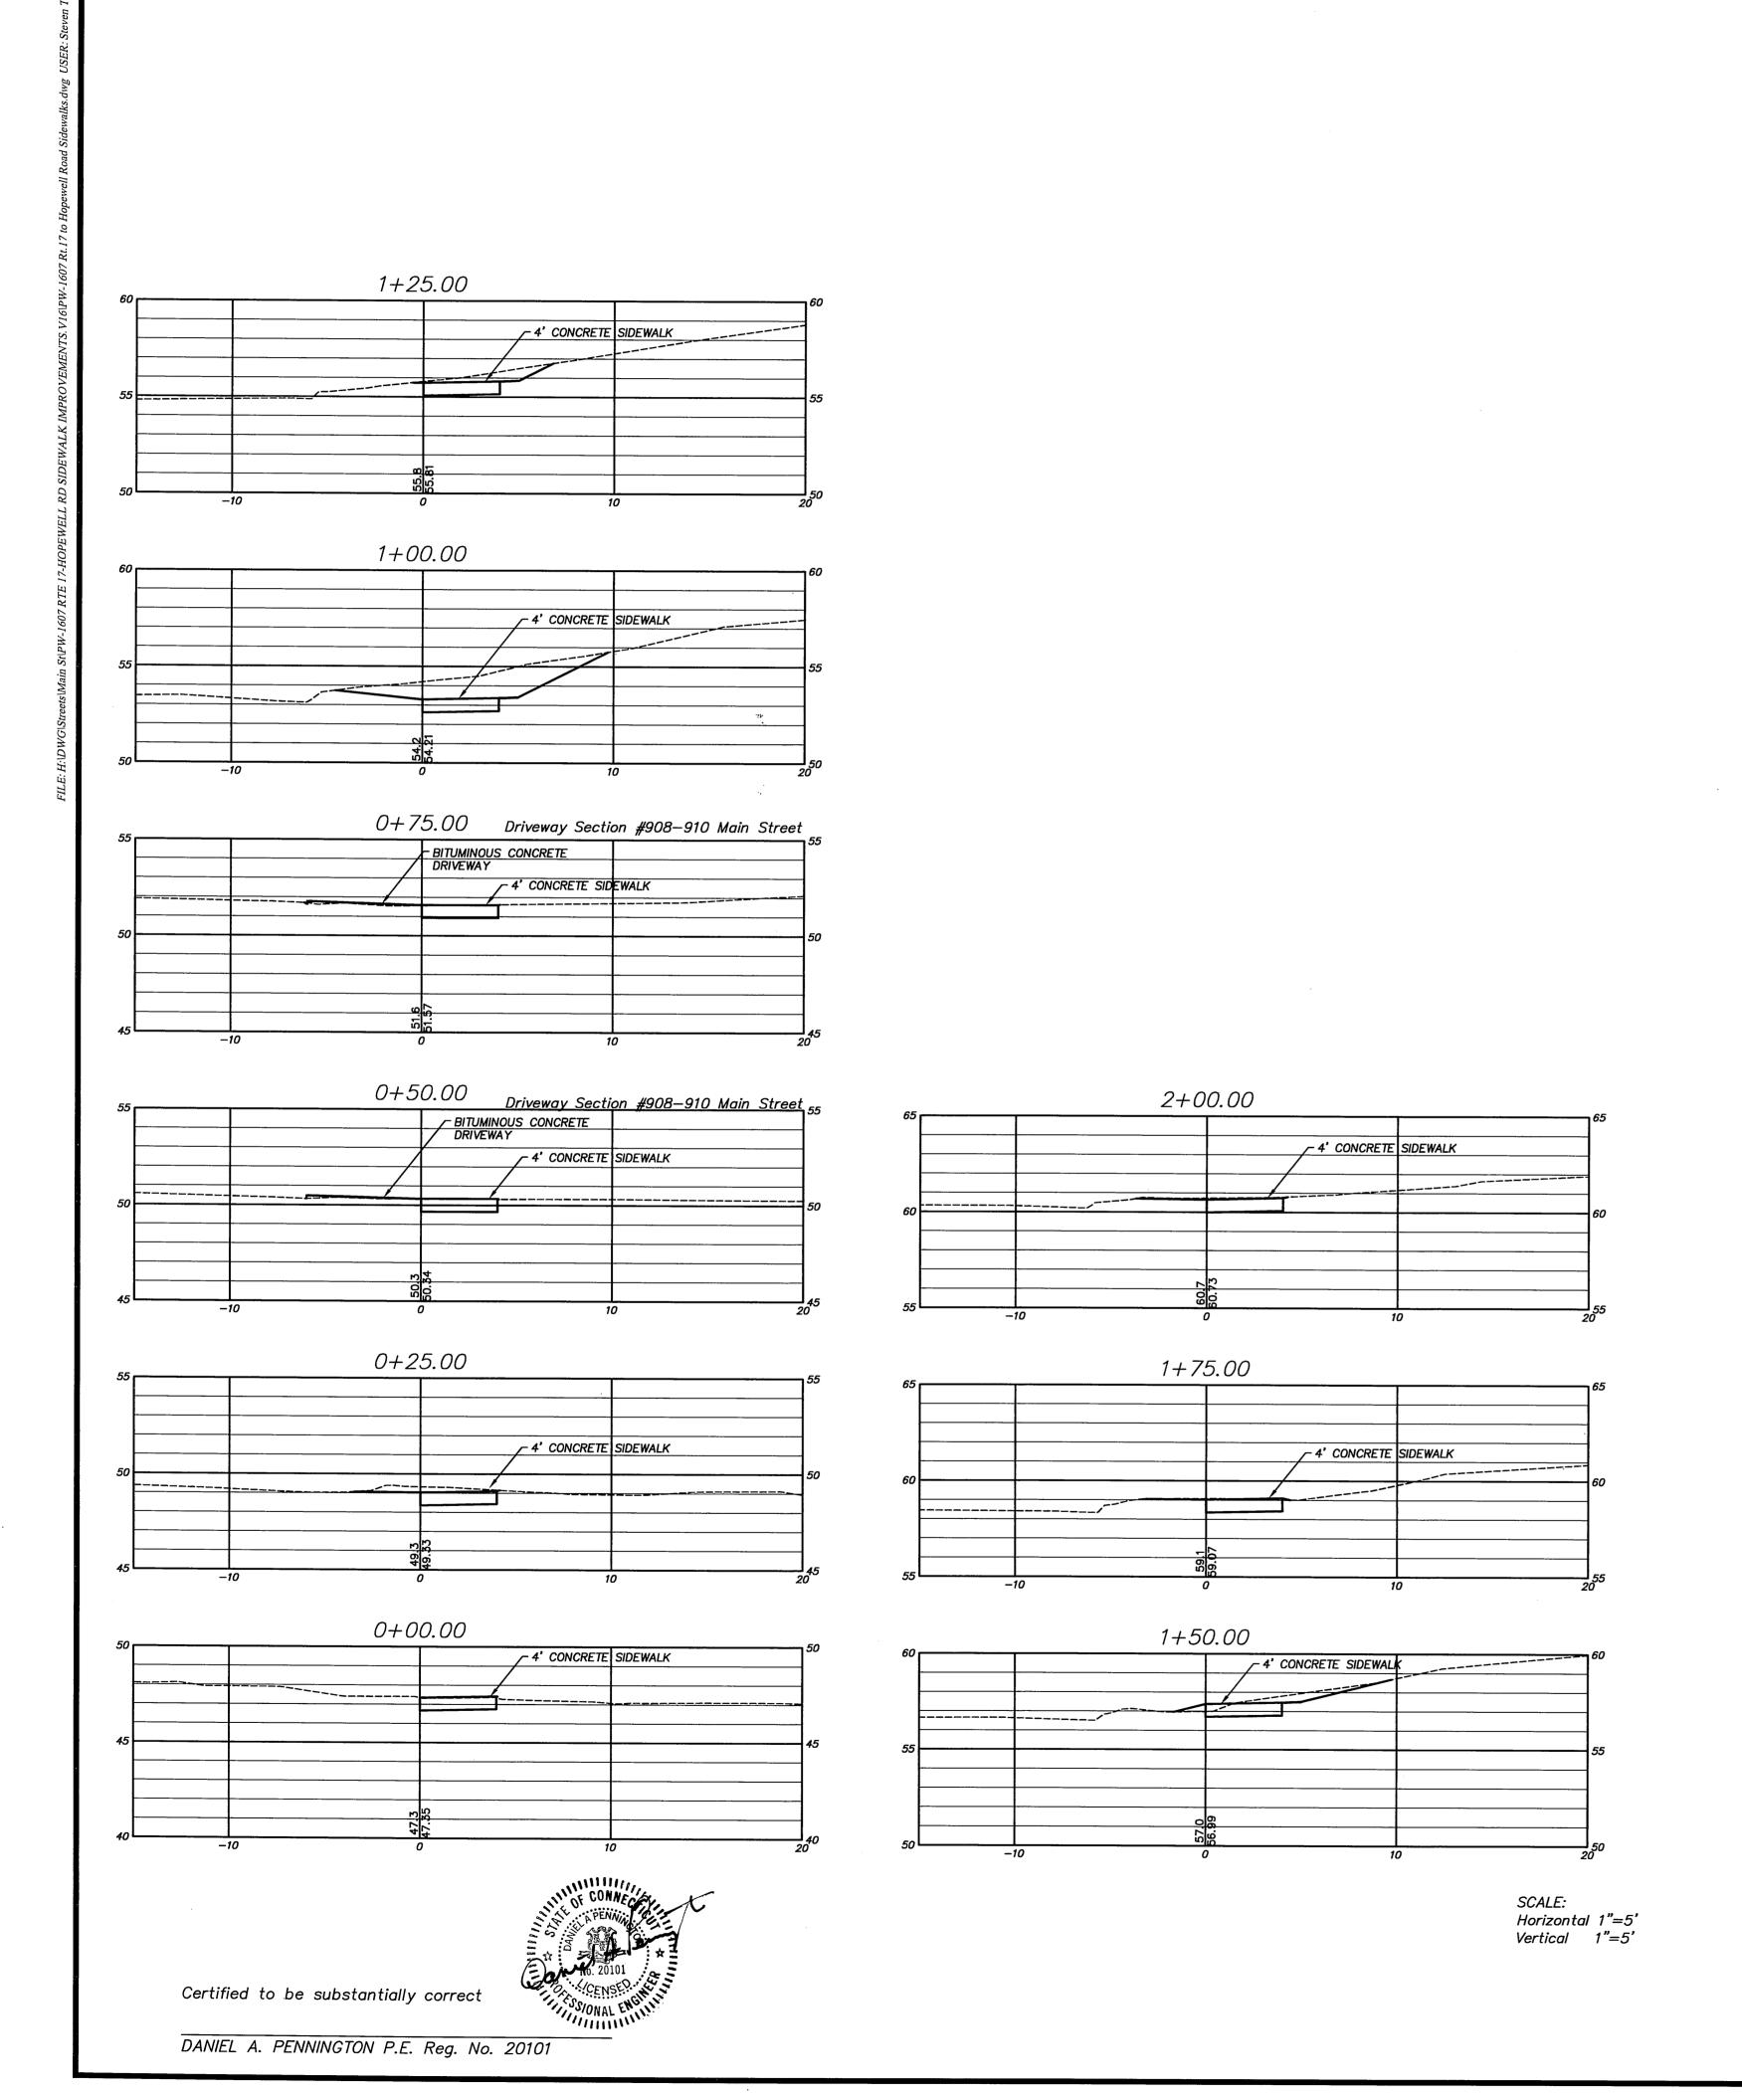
DETAILS DEPICTING PROPOSED SIDEWALKS ON MAIN STREET
